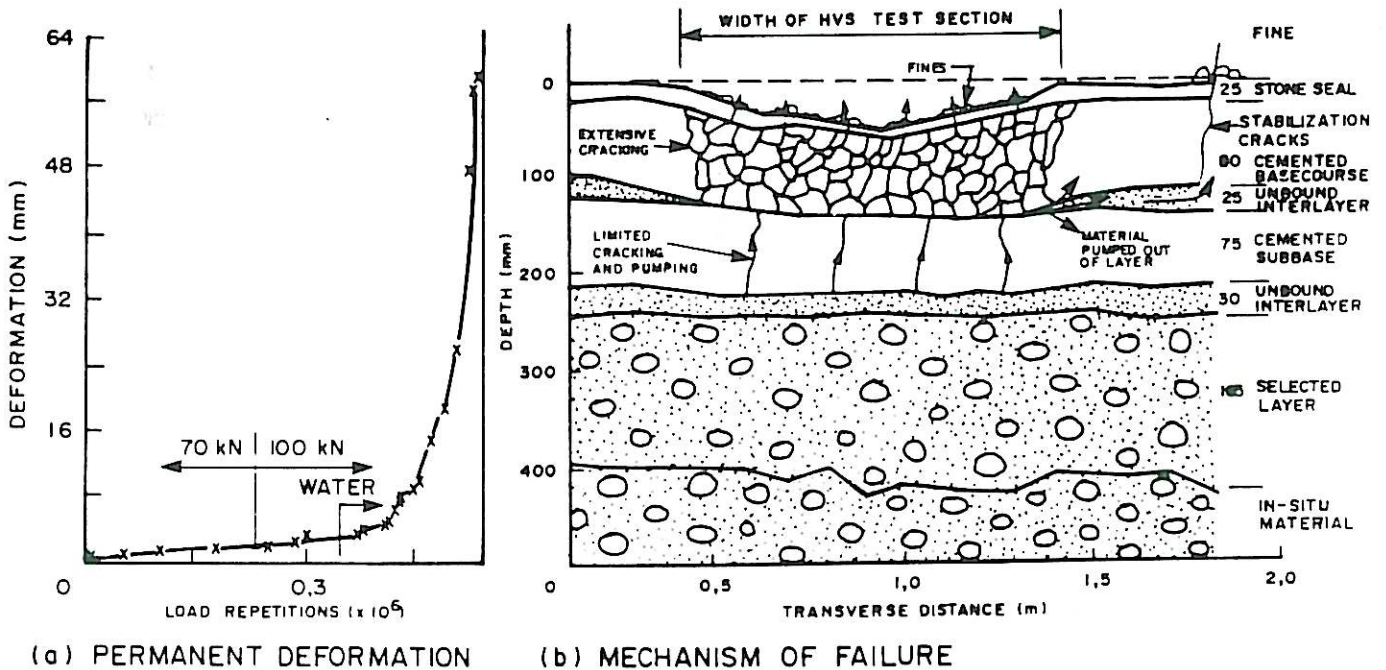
RESULTS FROM HVS TESTS ON A SHALLOW PAVEMENT STRUCTURE WITH CEMENTED BASE (Kloyn et al, 1985)
